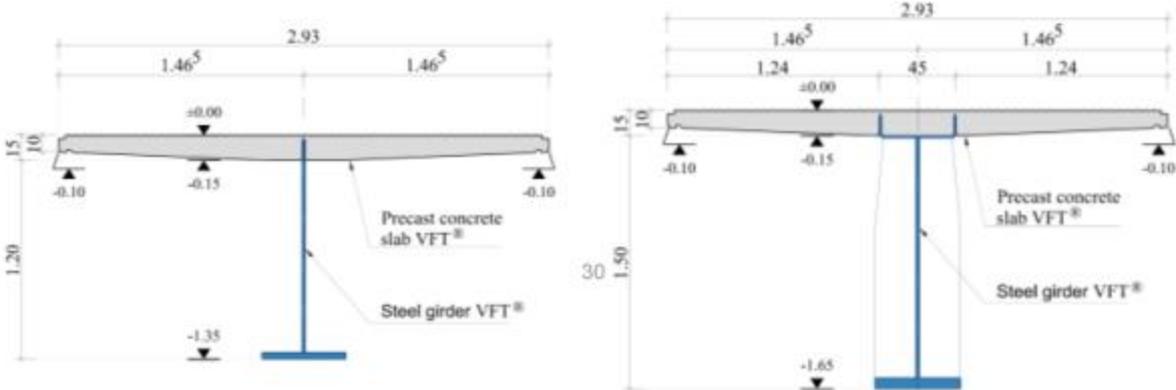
The formwork cross section of the Prefabricated Composite Girder VFT®
